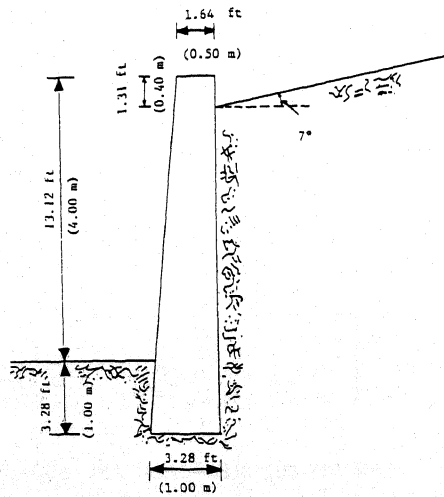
CROSS-SECTION OF WINGWALL AT LOCATION C-C (from Fig. 1)
